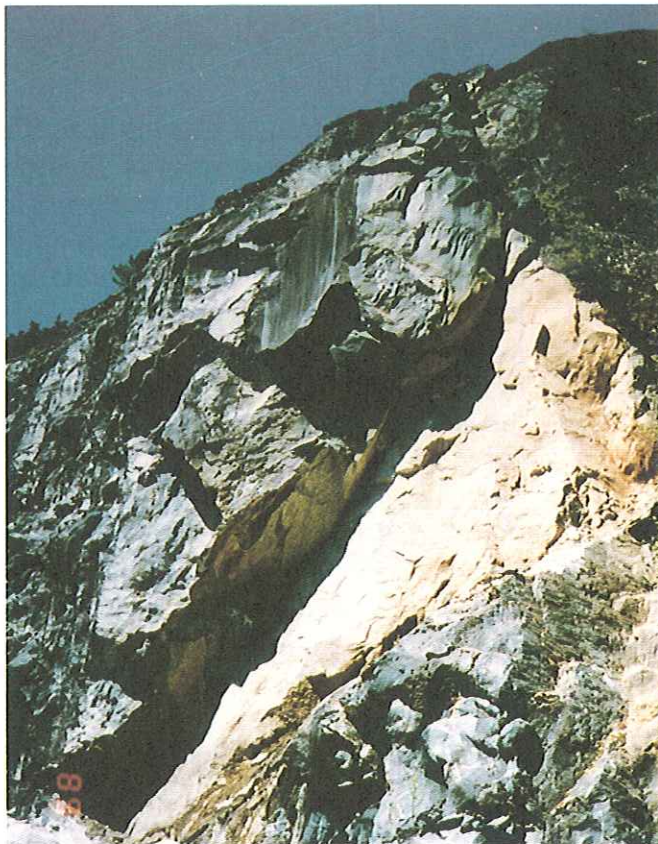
The rockfall was a planar failure sliding on a rough through-going joint that dipped out of the slope at about 70° . A release joint existed to the left (*Courtesy Washington Department of Transportation*).
